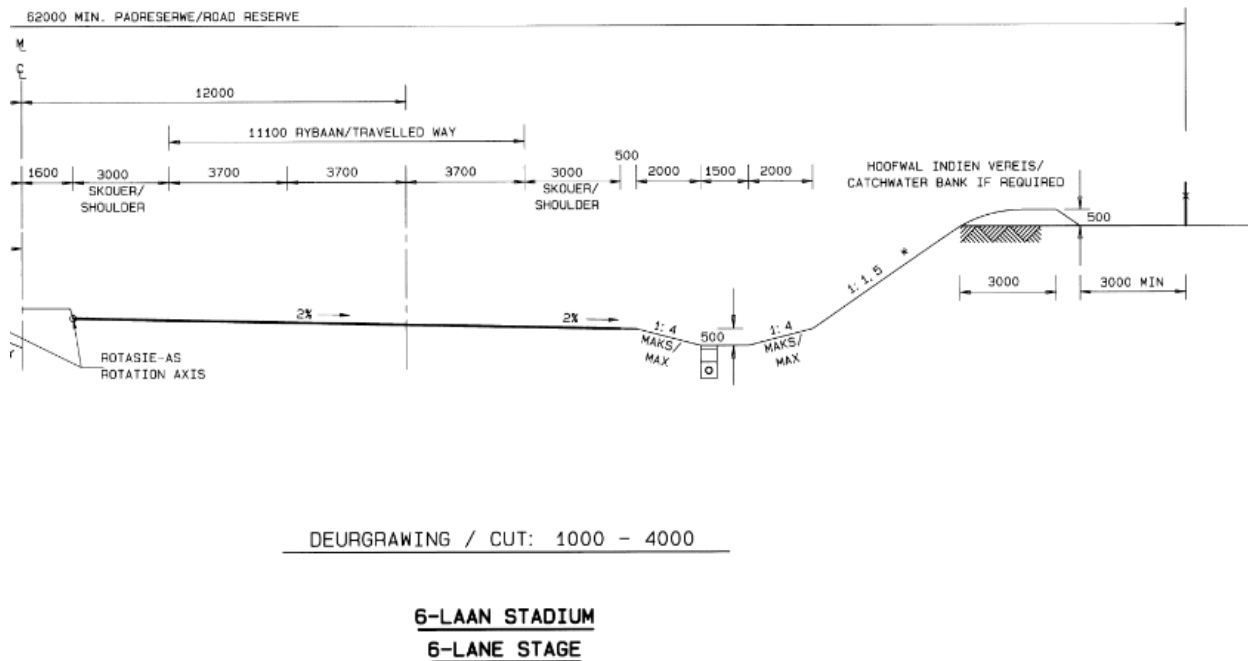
Typical Road Section (One Direction) (Knight Piésold, 2016)
